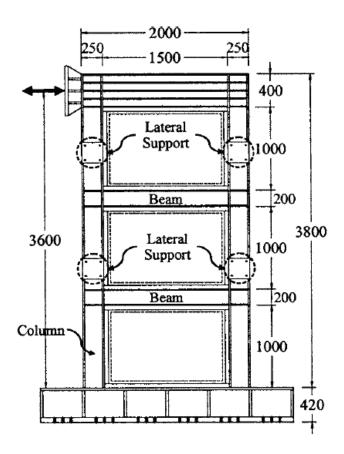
Dimension of the Specimen (Park et al. 2007)
